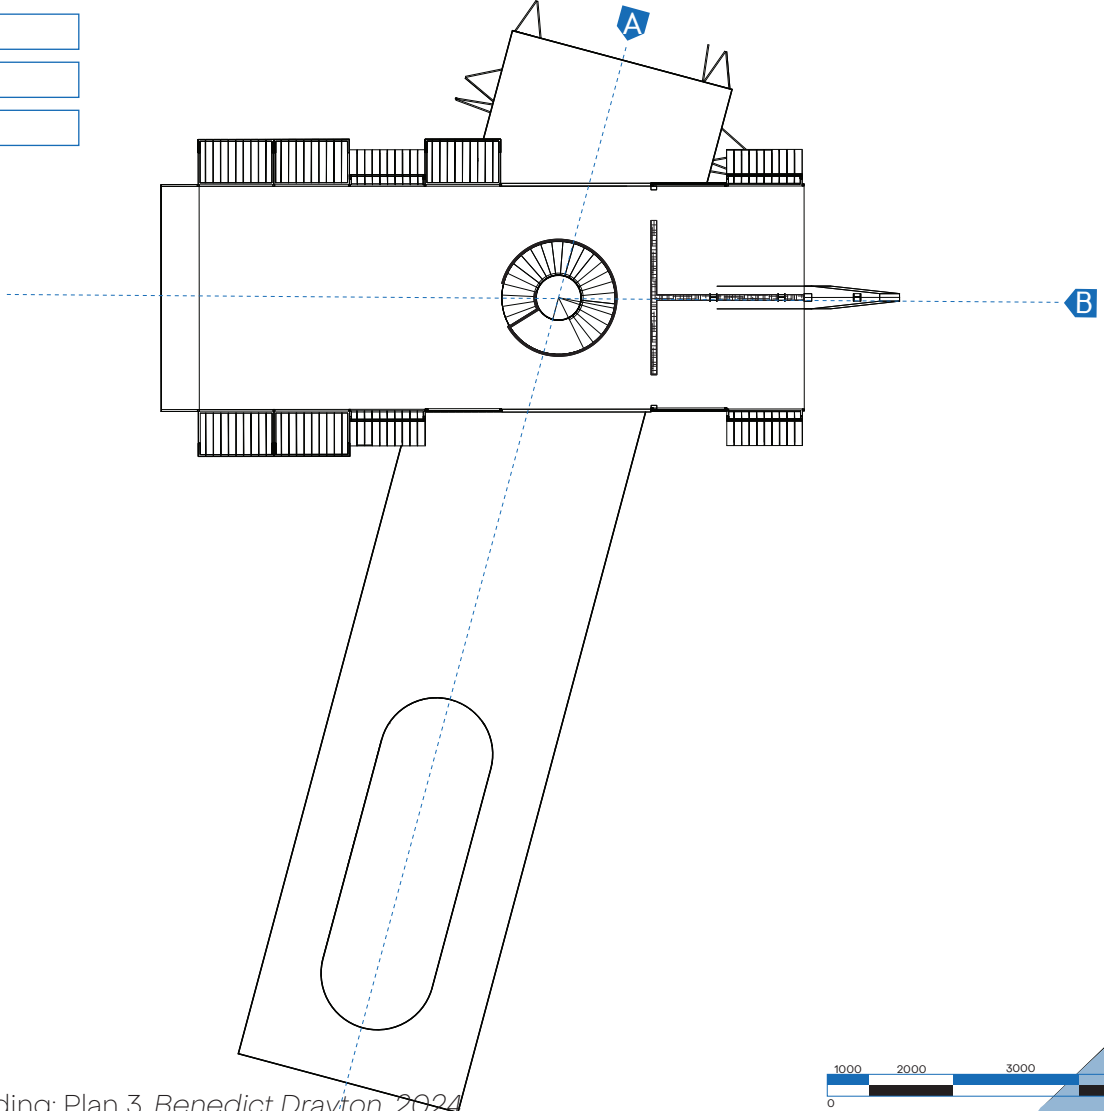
Anawhata Building: Plan 3, Benedict Drayton, 2024
